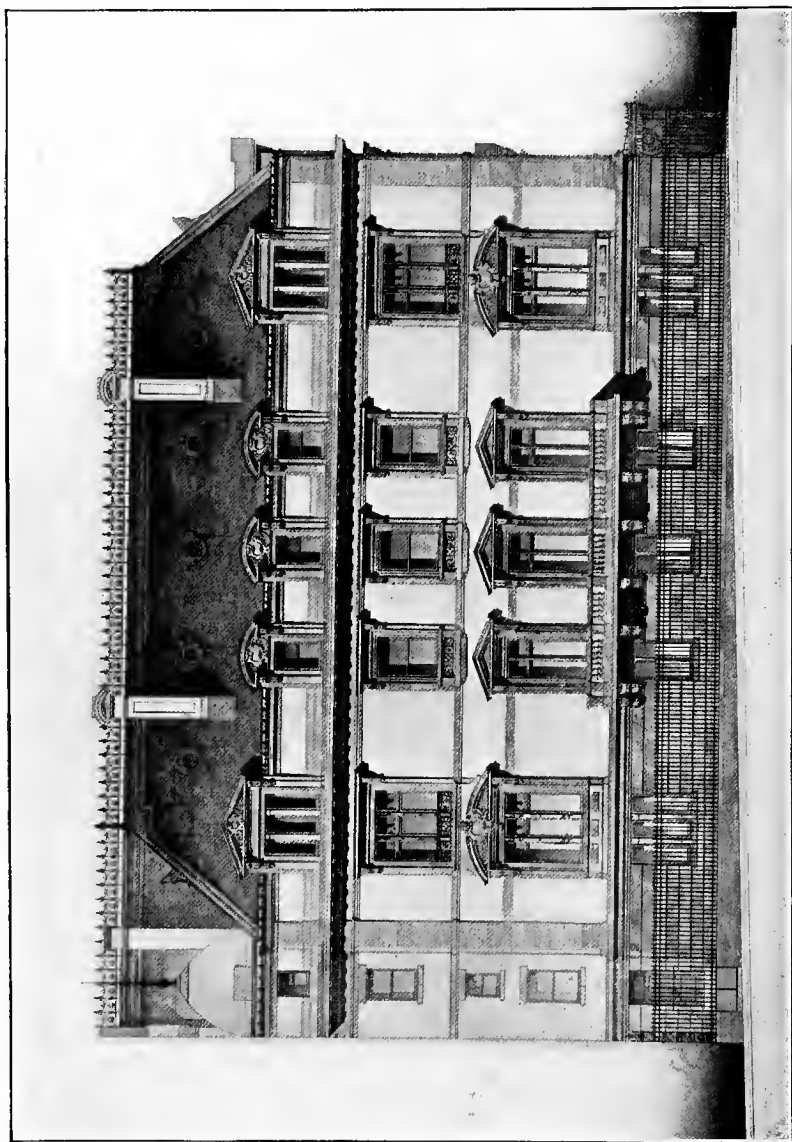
MADISON AVENUE ELEVATION, RESIDENCE OF R. FULTON CUTTING, ESQ., 67TH STREET AND MADISON AVENUE, NEW YORK CITY.
